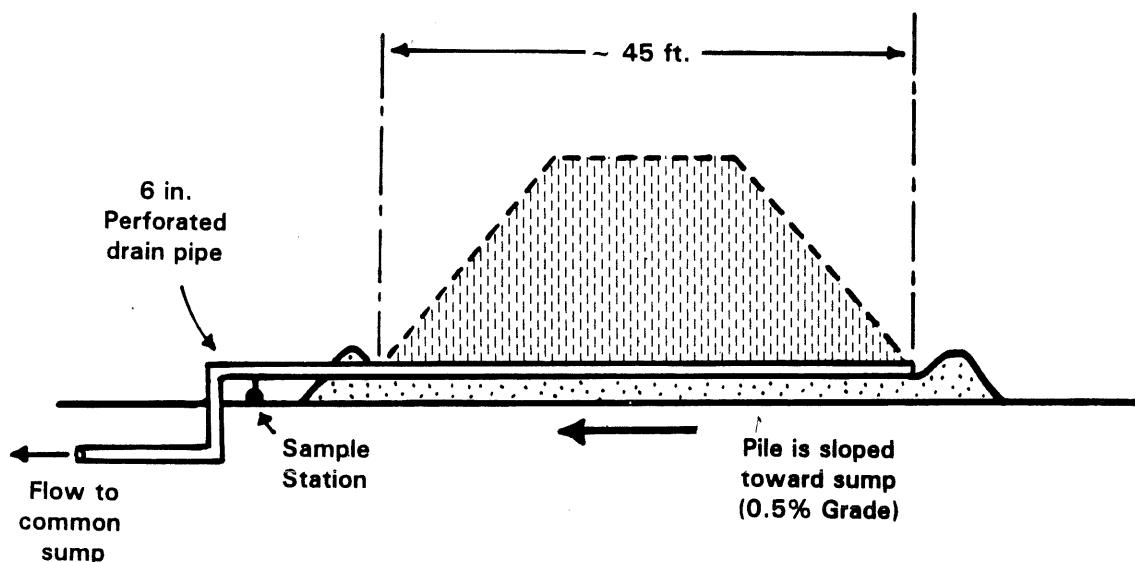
Leachate collection system beneath test piles (schematic; not to scale).
